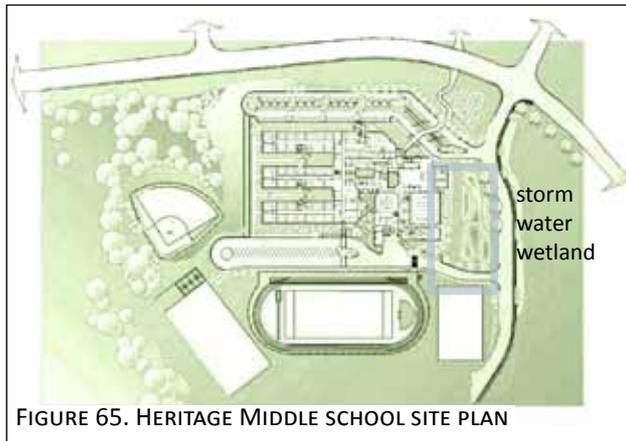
HERITAGE MIDDLE SCHOOL SITE PLAN
